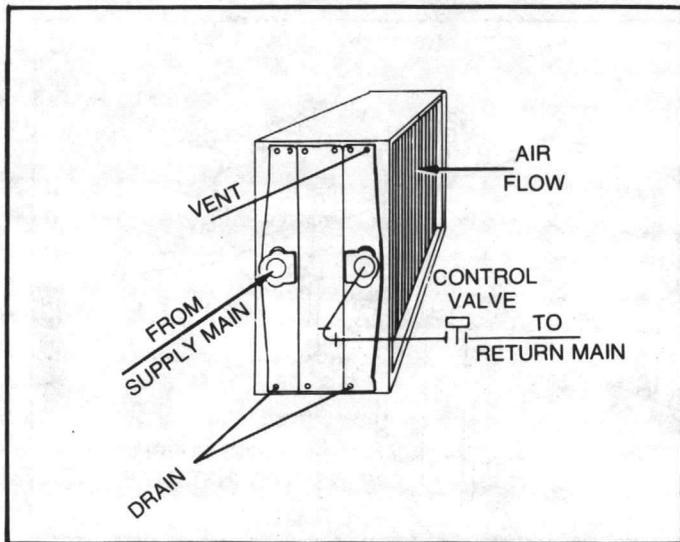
Typical Piping for Type DD Water Cooling Coil with Center Connections.
